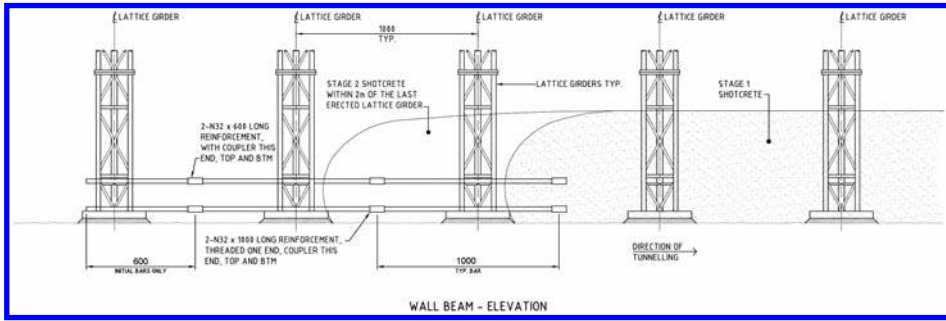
Longitudinal section along wall beam showing the shotcreting sequence.
